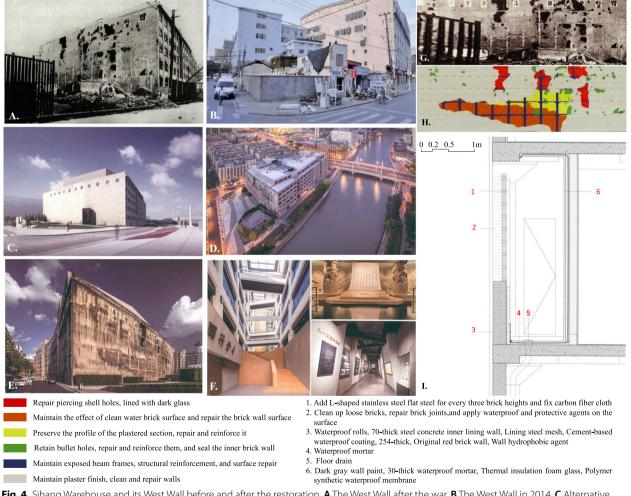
Sihang Warehouse and its West Wall before and after the restoration. A The West Wall after the war. B The West Wall in 2014. C Alternative design plan of the West Wall. D A bird's-eye view of the restored Sihang Warehouse. E The restored West Wall. F The central corridor and exhibition hall. G Restoration photo of the West Wall. H Specific restoration methods for different types of damage. I Detailed drawing of the West Wall's holes. (Source: B from Qiang 2021; others from Tang and Zou 2018)
